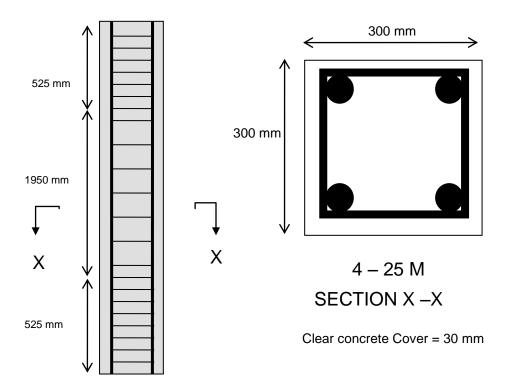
Reinforcement detailing of columns used in numerical simulations.
